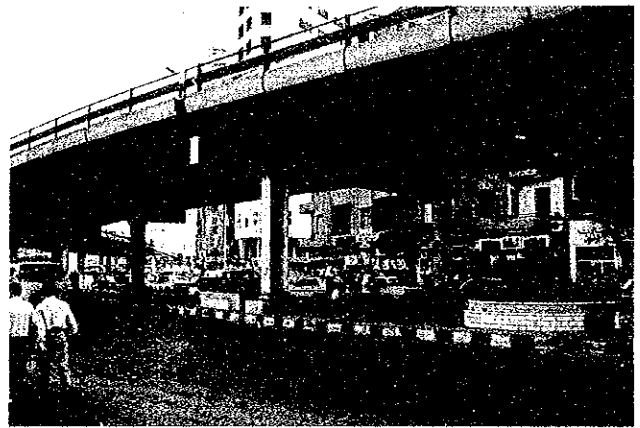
Elevated bridge in Cairo (steel piers and fixed piers are reinforced with bracing)
